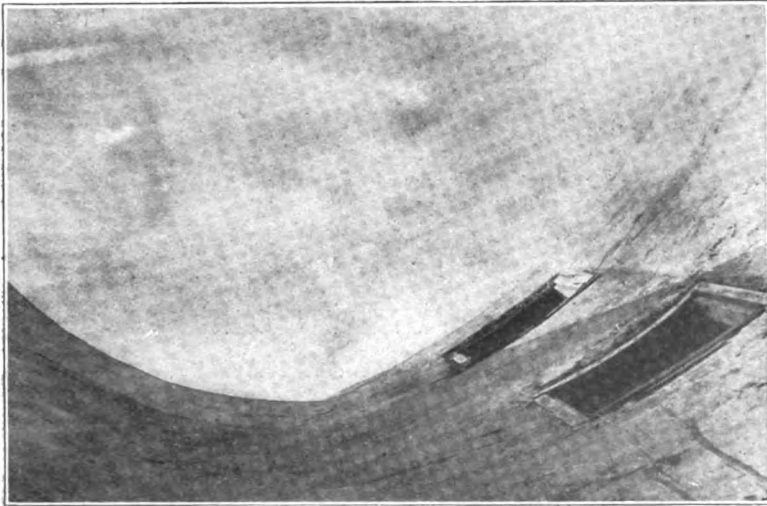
View Out the Top of a Concrete Silo Which is Not Round. Shows the Usual Method of Constructing Door Frames
